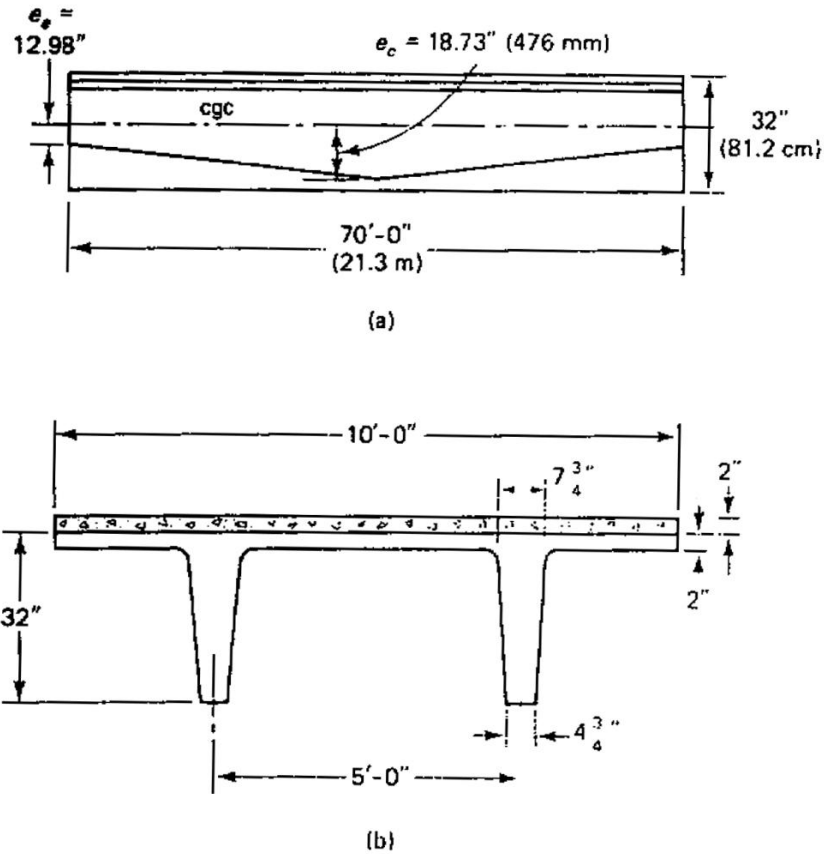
Double-T pretensioned beam. (a) Elevation. (b) Pretensioned section.
